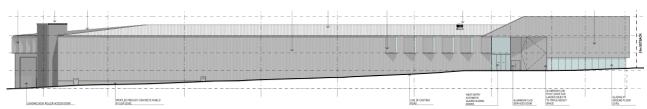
Proposed west elevation Source: Lahznimmo Architects
